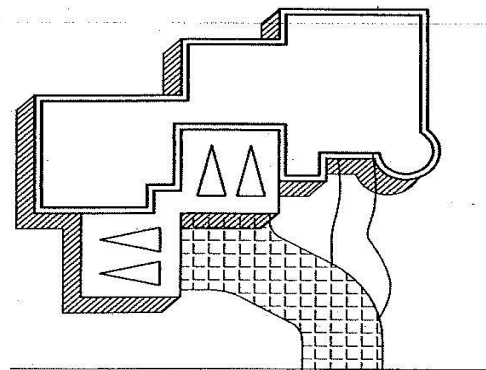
DRIVEWAY AND GARAGE DESIGN
